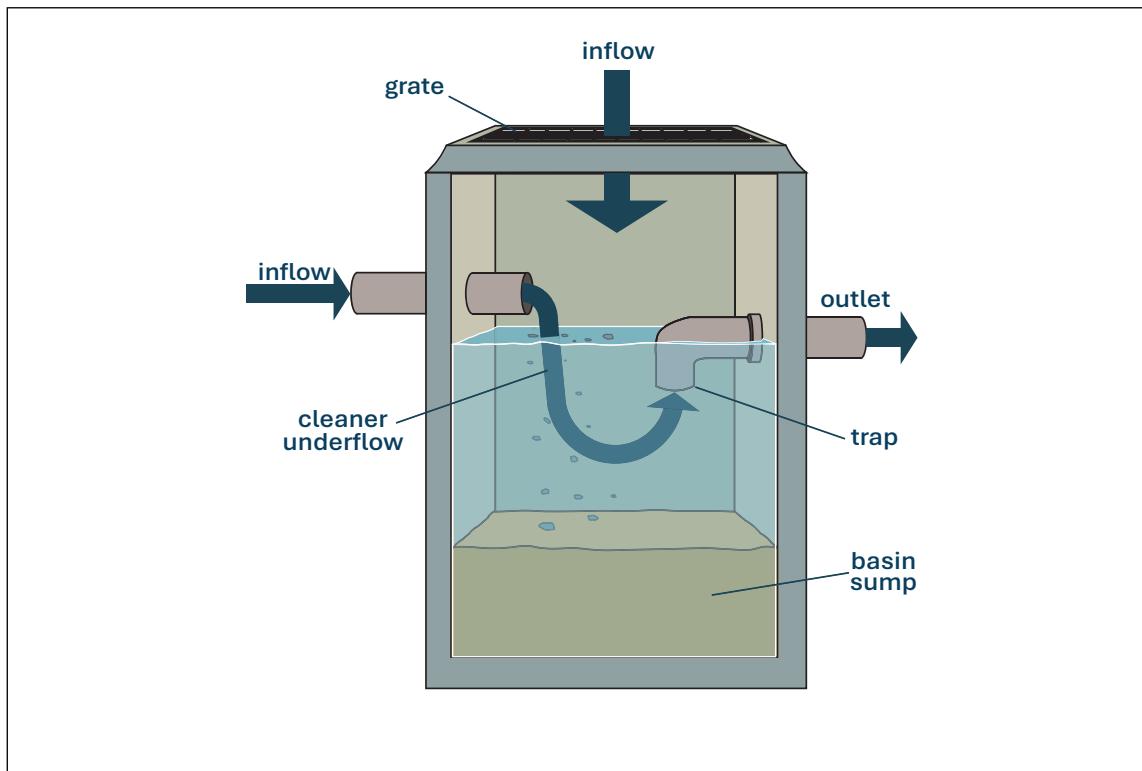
Typical drainage catch basin arrangement
